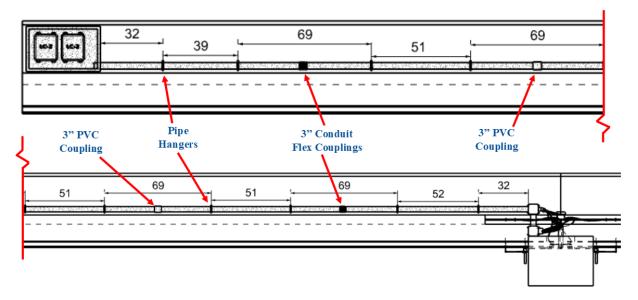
, Drawing, Bridge End View No.2 (from Southeast Perspective)
